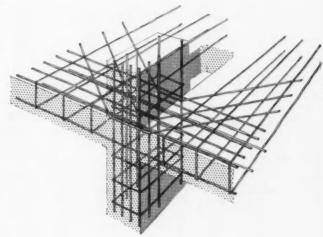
This schematic diagram indicates how reinforcement might be arranged to prevent the failures shown by keeping stresses within the capacity of the concrete. To simplify the drawing, general reinforcement of the slab is not shown
